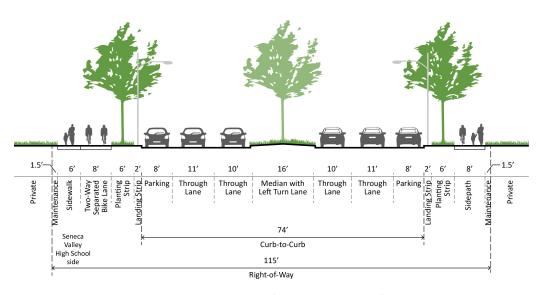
Proposed Typical Street Section for Wisteria Drive from Waters Road to Crystal Rock Drive
